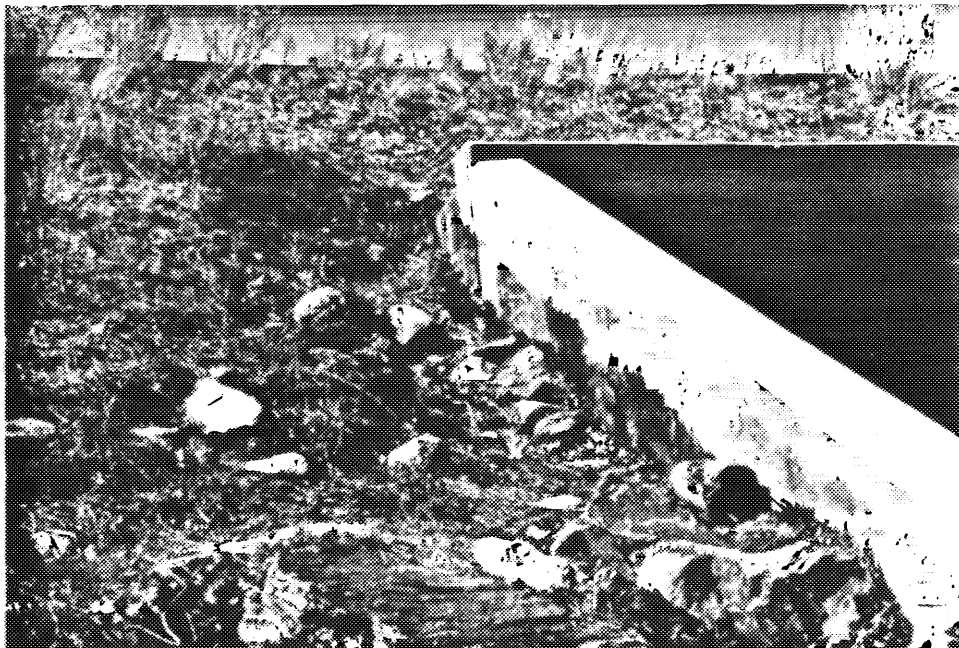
Closeup of erosion along the right wing wall of the culvert outlet.
